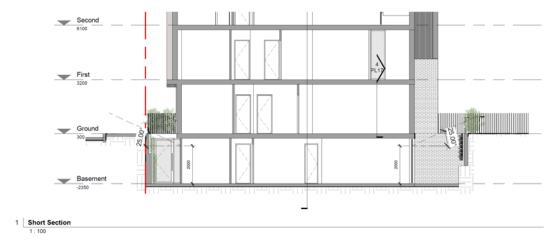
Section showing the design guidance for creating a light well for a basement or lower-ground floor.
